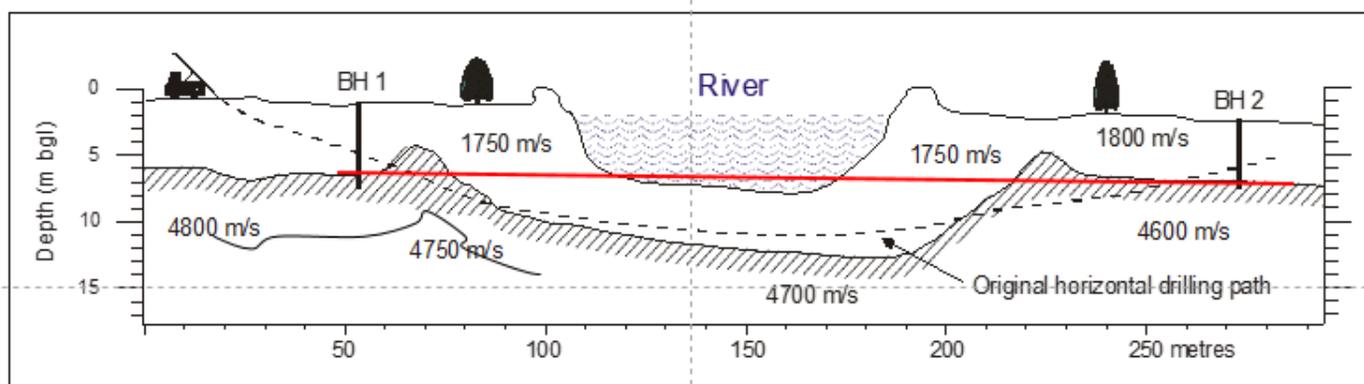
Schematic drawing of proposed Horizontal Directional Drilled (HDD) river crossing.
